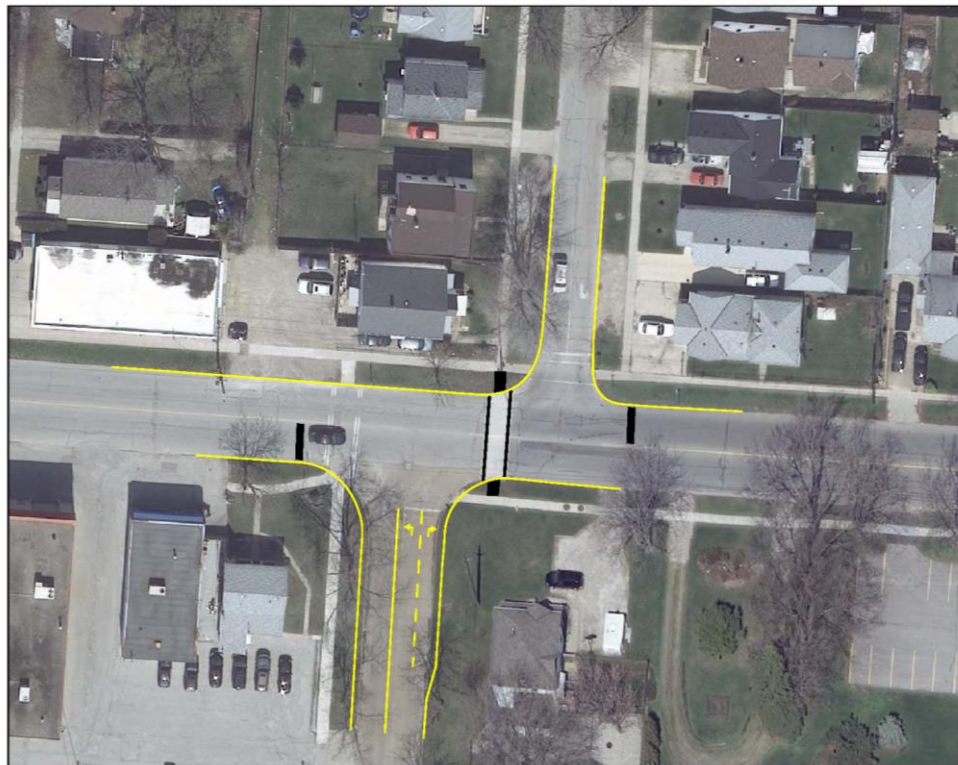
Improvements to the Oak Street at Wigle Street Intersection
